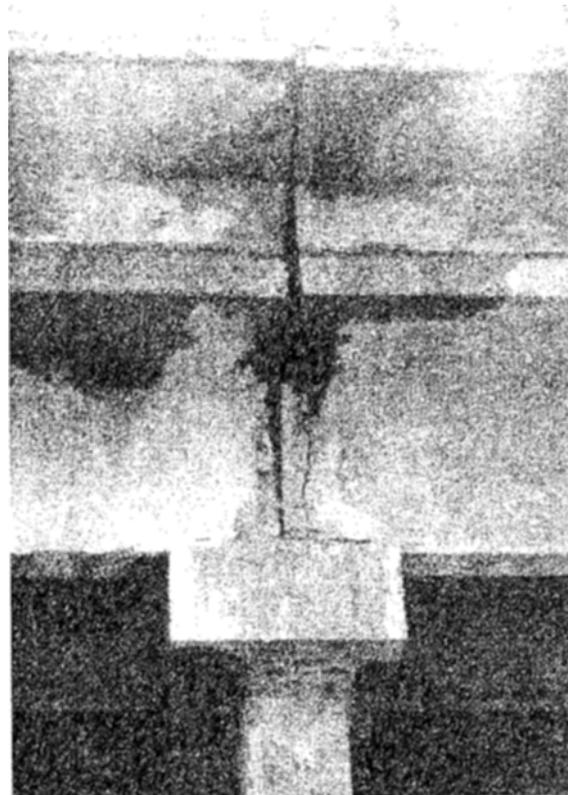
Deterioration of edges of beams and cap of pier due to leakage of expansion joint
